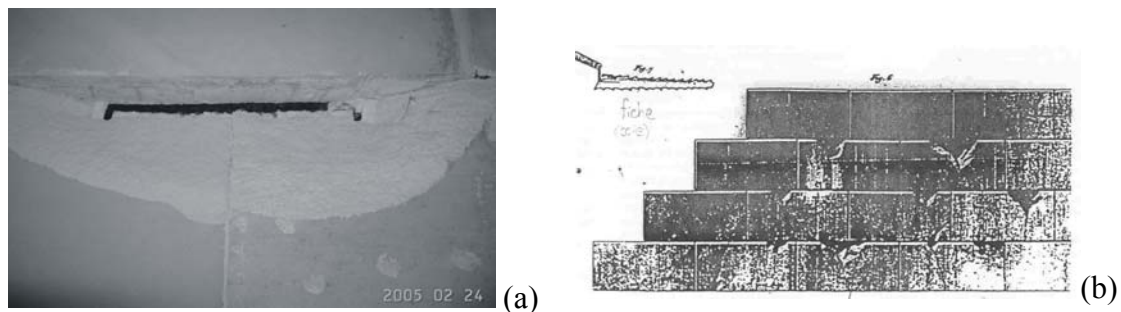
(a) Typical crack path of detaching stone fragments near an iron clamp; (b) splitting and spalling observed in the stone piers of the main dome (Plate XV of [1])
